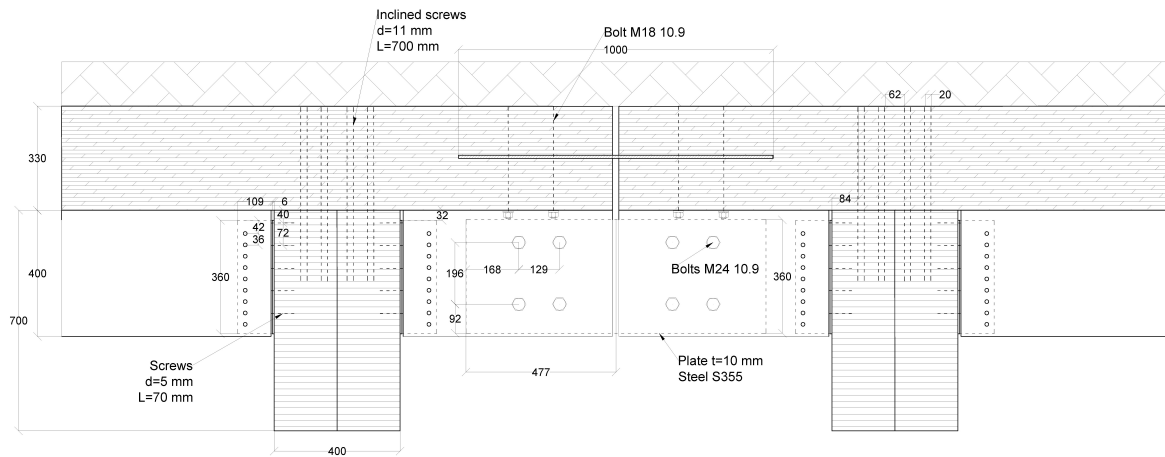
Connection of cross girders to cross girders and cross girders to main girders. Joint between deck panels in global x-direction is shown as well.
